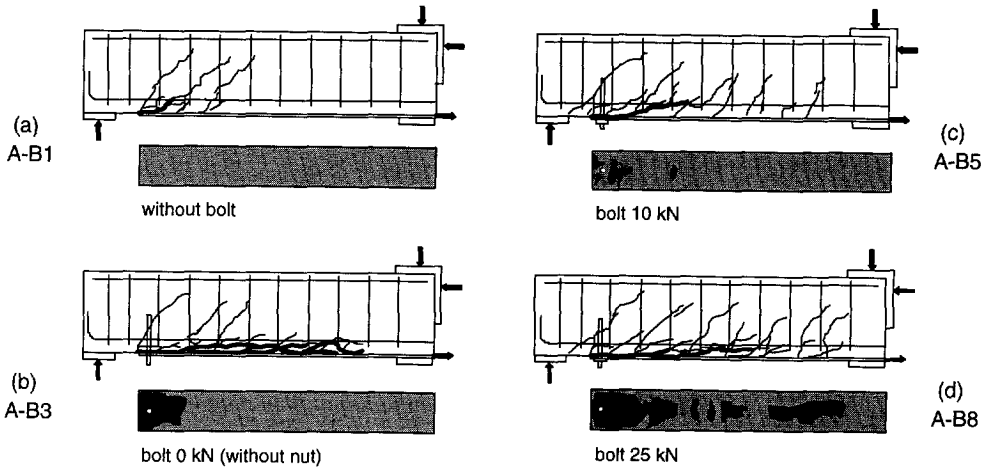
Crack patterns of beam-ends. (a) A-B1 without a bolt (b) A-B3 with bolt without nut (c) A-B5 with force in the bolt of 10 kN and (d) A-B8 with force in bolt of 25 kN (light grey = concrete failure, dark grey = interface failure)
